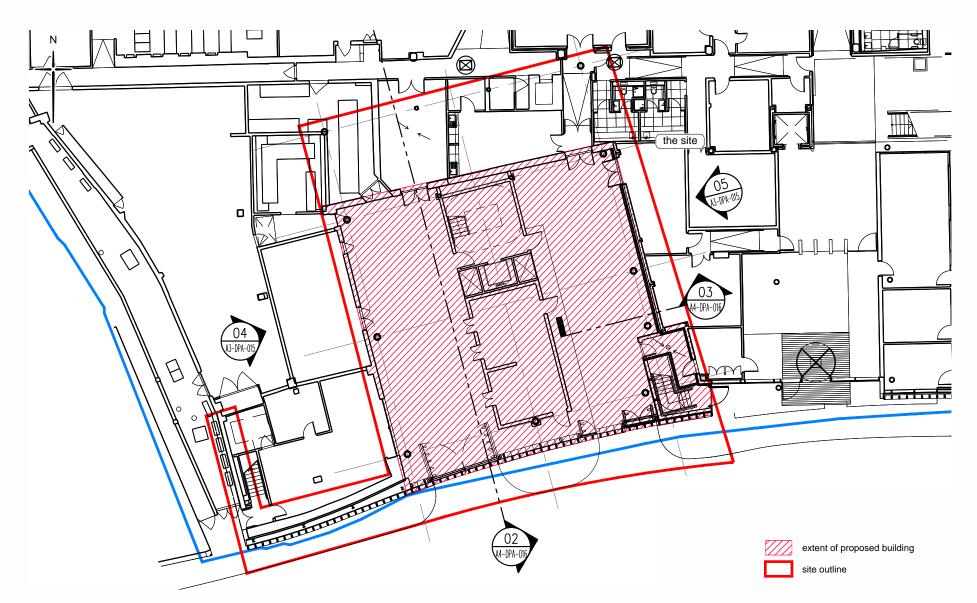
Proposed ground floor plan (WATG, dwg A2-DPA-007, rev 0, 27/02/15)
